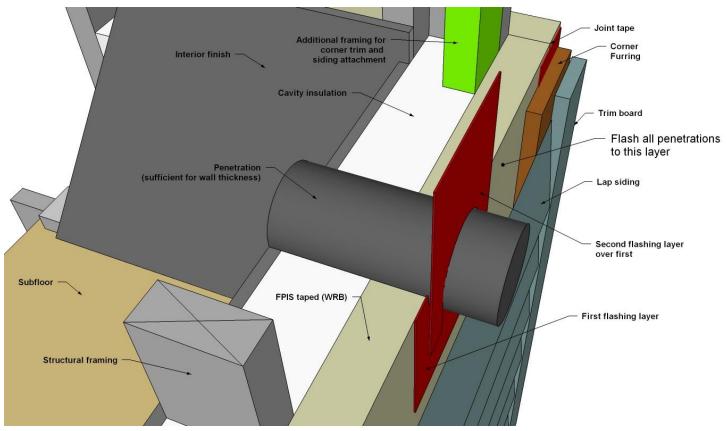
Penetration - 2" FPIS Taped Joints, Furring, Lap Siding
